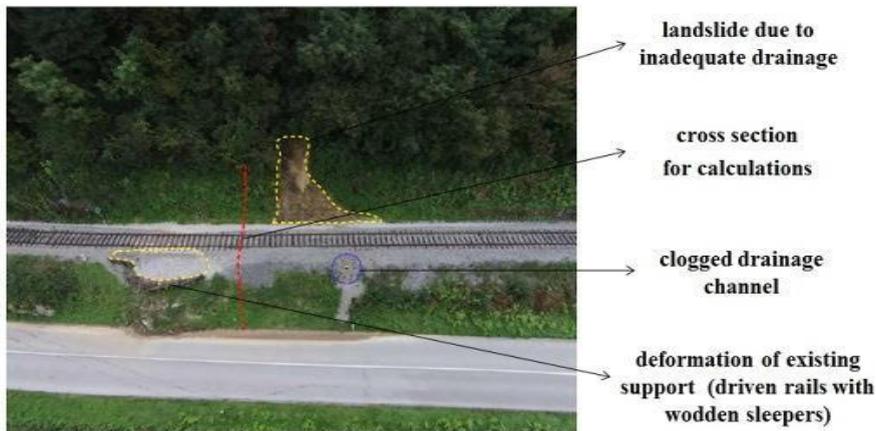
Typical problem of embankment instability – image recorded with UAV, as a part of the repair project on railway track in Croatia.
